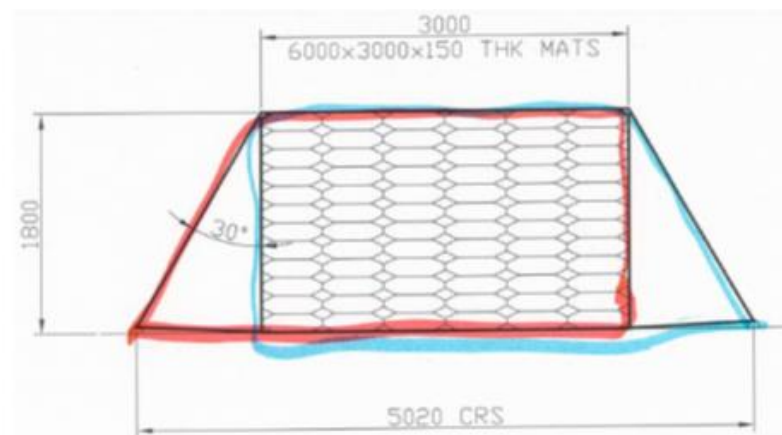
Typical seafastening of a concrete mattress stack with cargo straps attached to padeyes
